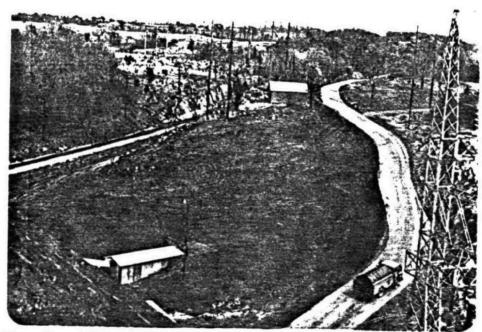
View from the roof facing north showing the coal storage area transfer station, and a portion of the electrical switchyard.
